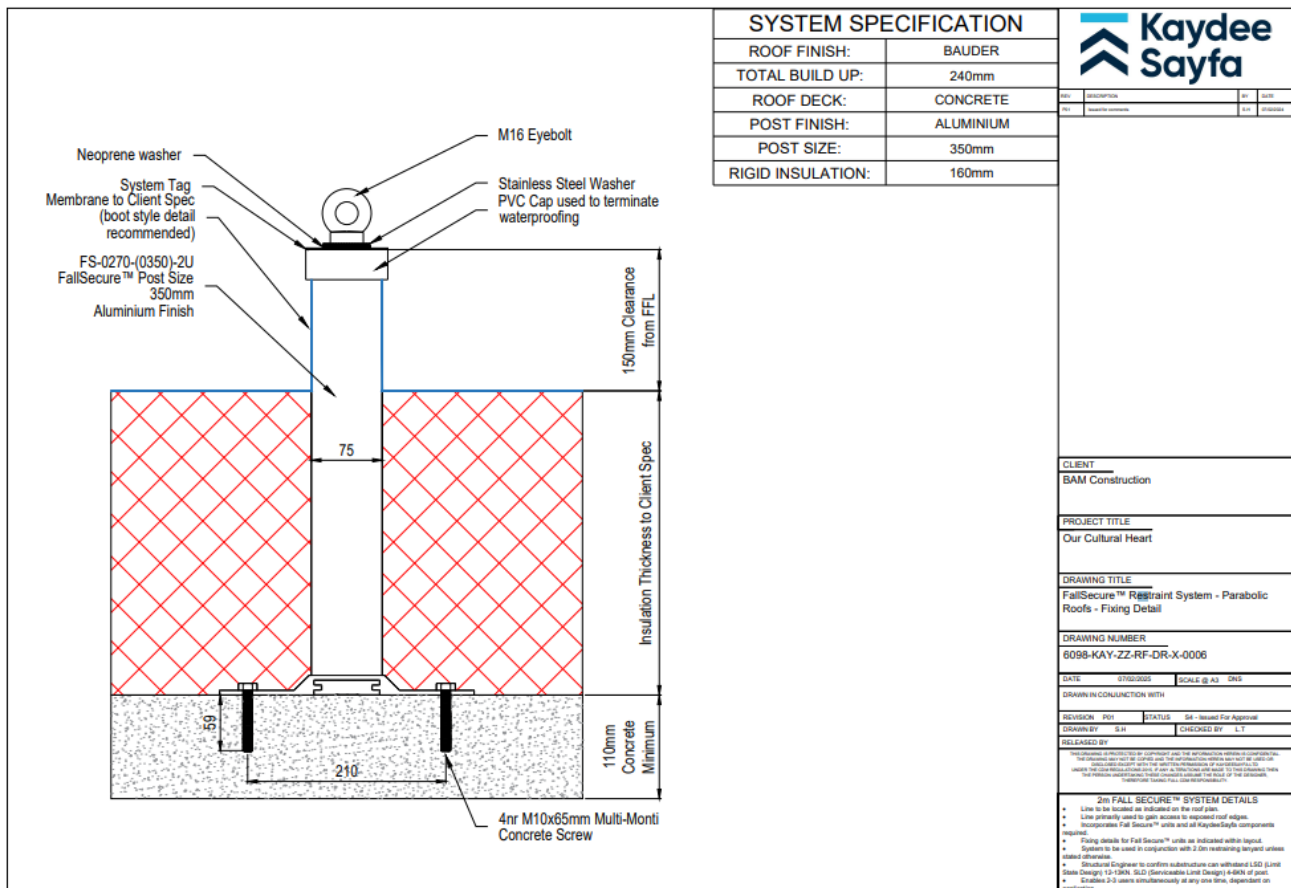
6098-KAY-ZZ-RF-DR-X-0006 Proposed Mansafe Post Details Plan
